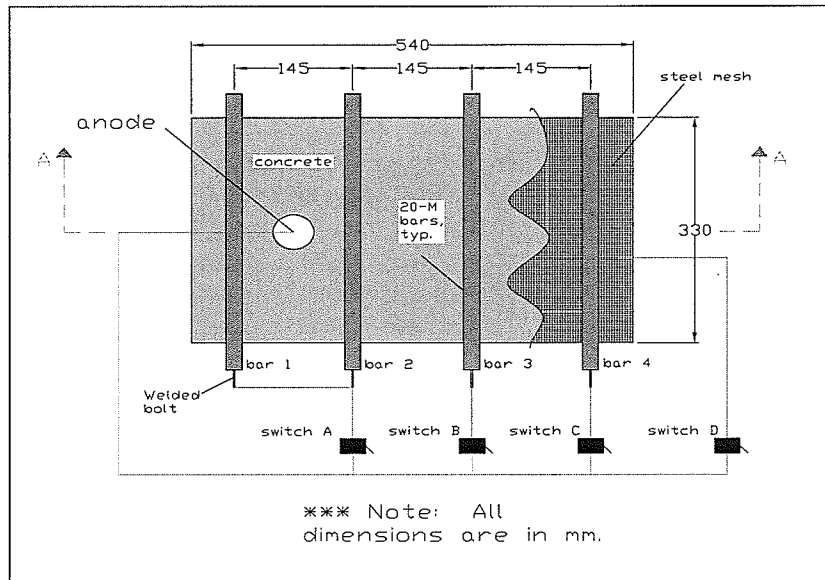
Plan view of typical reinforced concrete slab specimen with embedded galvanic anode system
